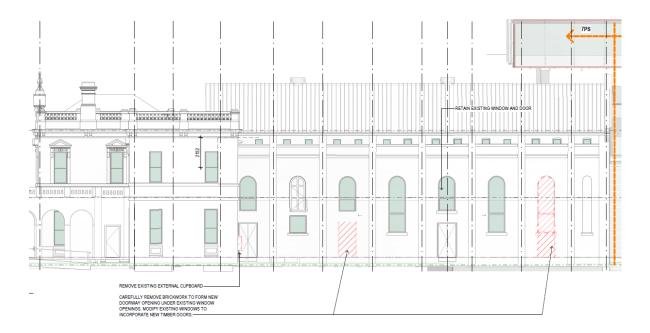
Southern elevation existing (Source: Architectural Drawing No. AR-DA1-2000, Rev C)
